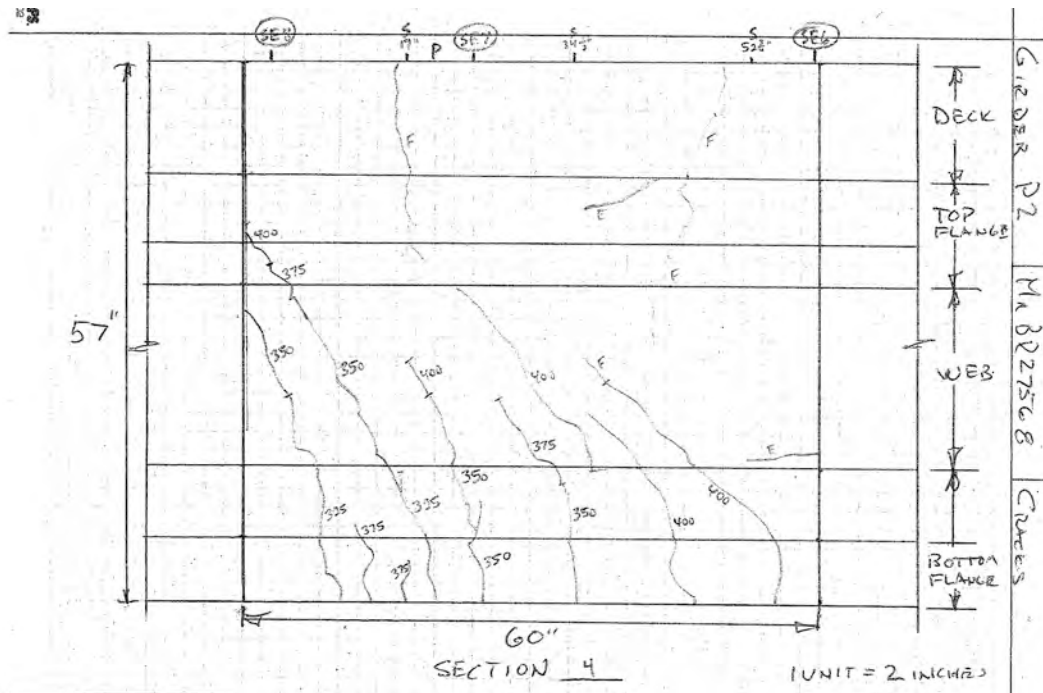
Girder P2 crack pattern – Section 4
